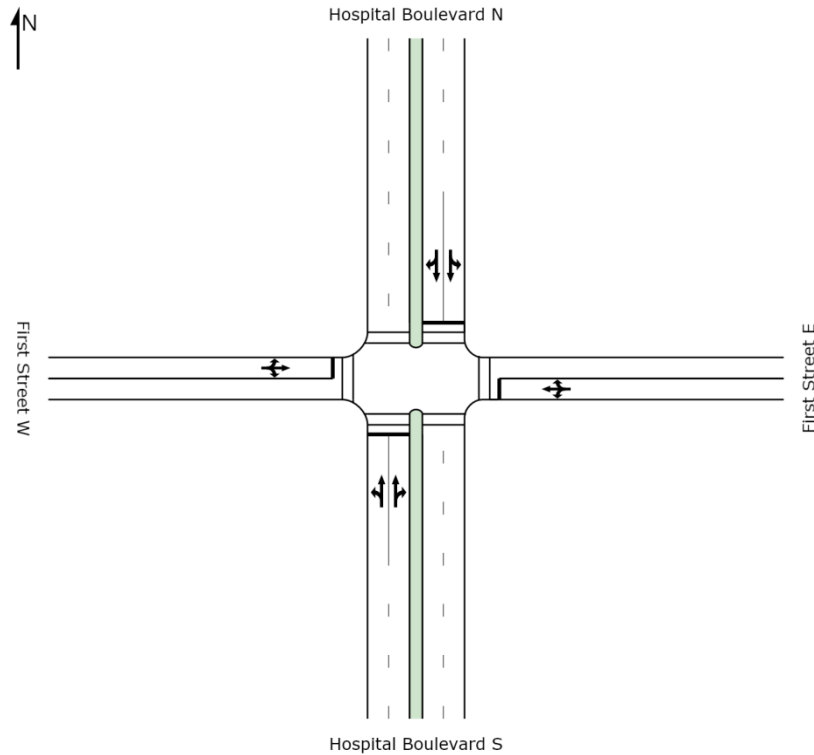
Hospital Boulevard / First Street – SIDRA Intersection Layout
